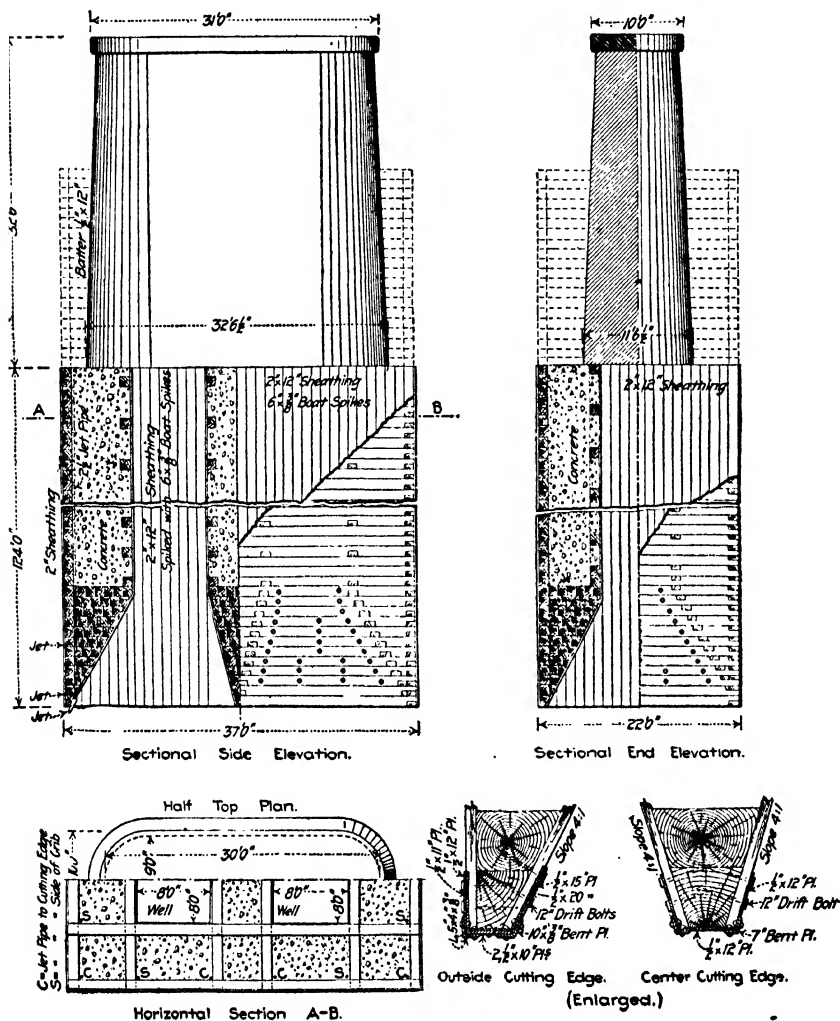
Open Caisson for Pier 4, Fraser River Bridge, New Westminster, B. C.
